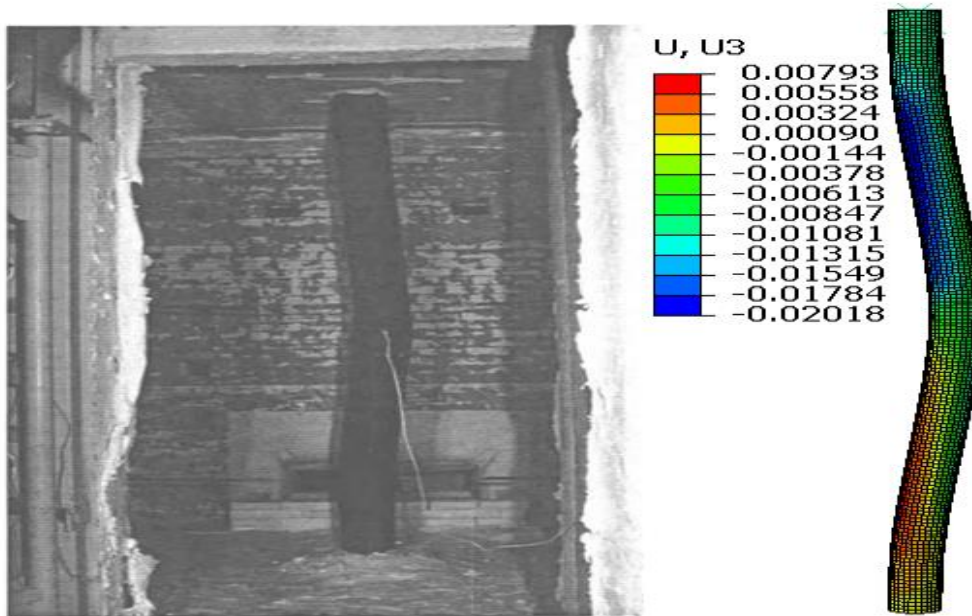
Deformed shape of CFST column C08 from test result and Abaqus output
